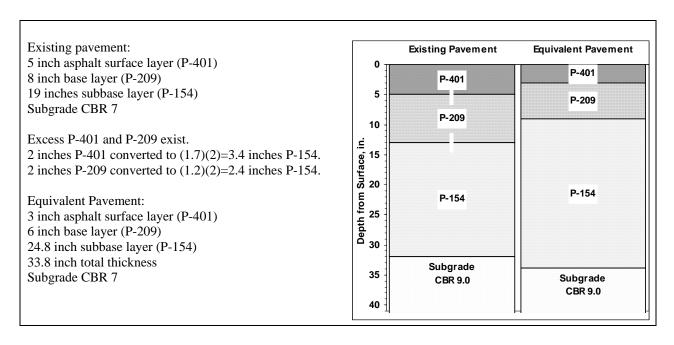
Flexible Pavement Example 2 Cross-Section
